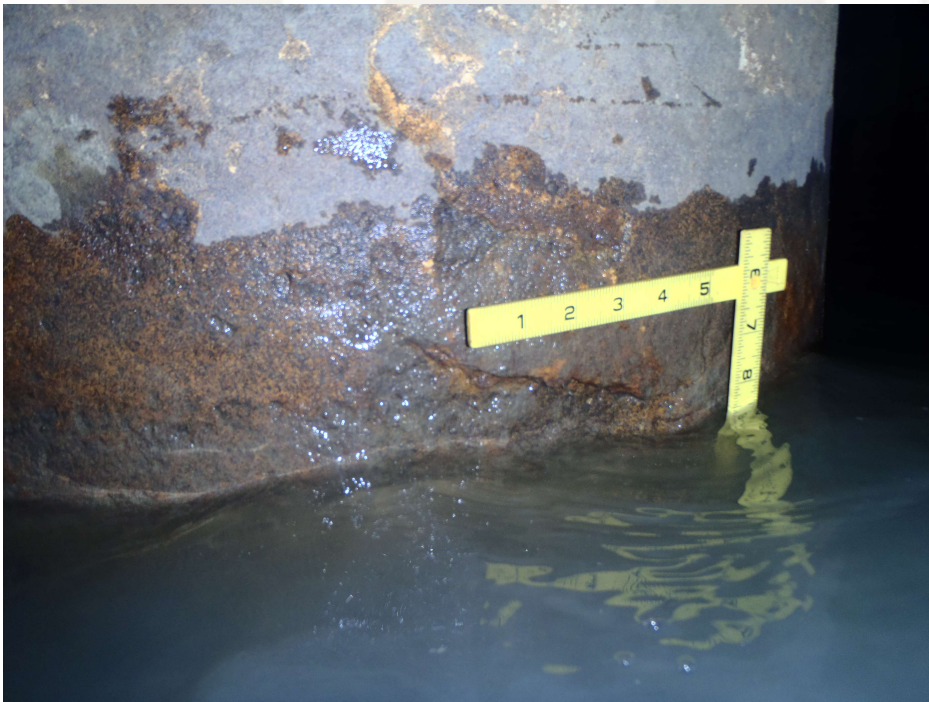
Bent 1, Pile 19, Spall at South Quadrant, 5' Below the Cap
